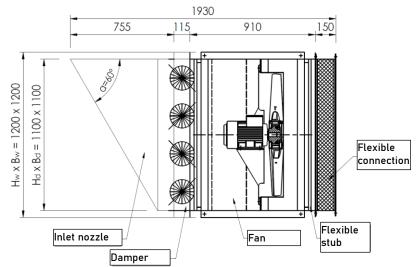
Basic dimensions of the standard mcr EXi-F 90-1S, 90-2S, 100-1S, 100-2S air supply units in a box-type housing - horizontal installation.
